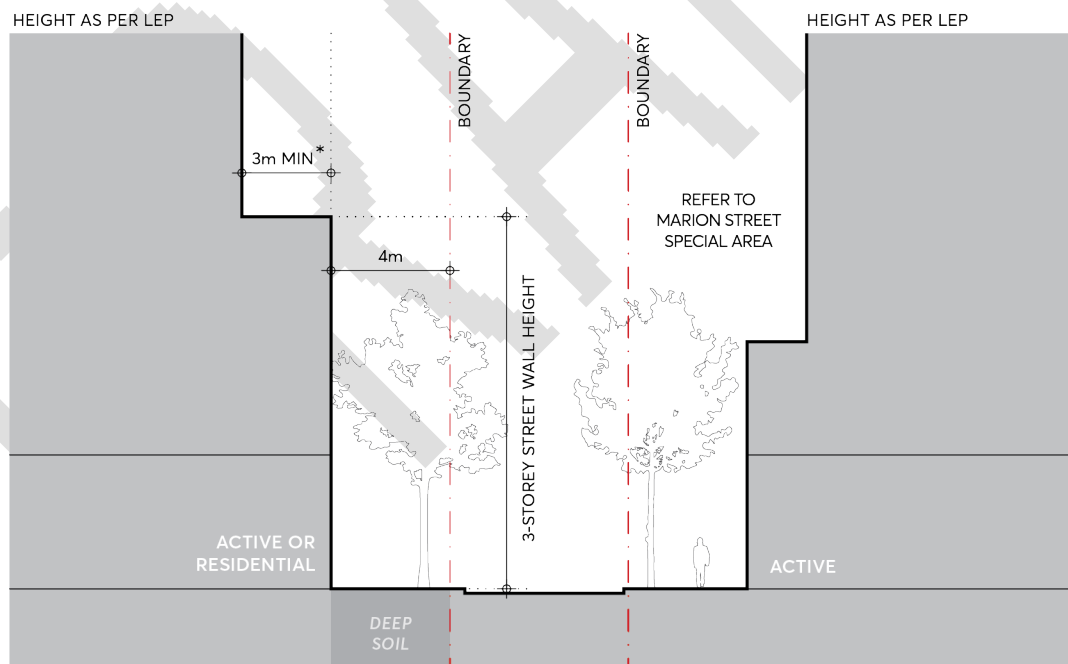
Raymond Lane (Section C) Setbacks and Street Wall Height
